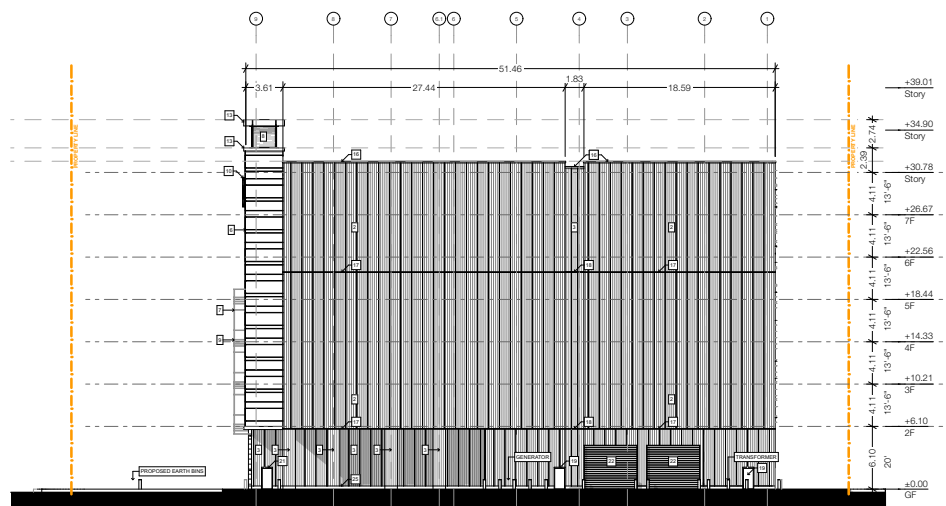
East Elevation of the proposed building by TACT Architecture Inc.
